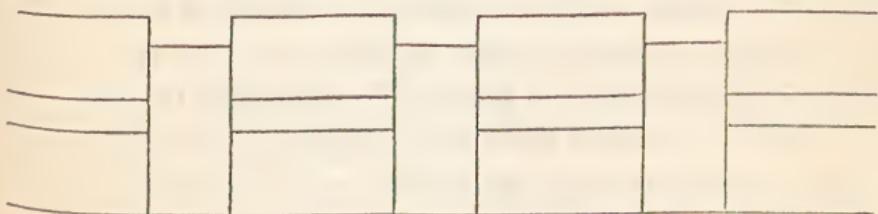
Loudon's hollow brick wall, 11 inches thick.
